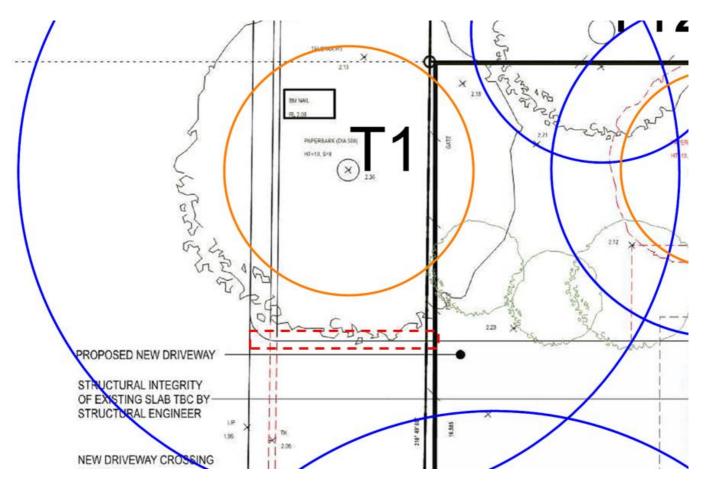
LOCATION OF ROOT INVESTIGATION TRENCH SHOWN OUTLINED IN RED ON AN EXCERPT OF THE PROPOSED GROUND FLOOR PLAN
